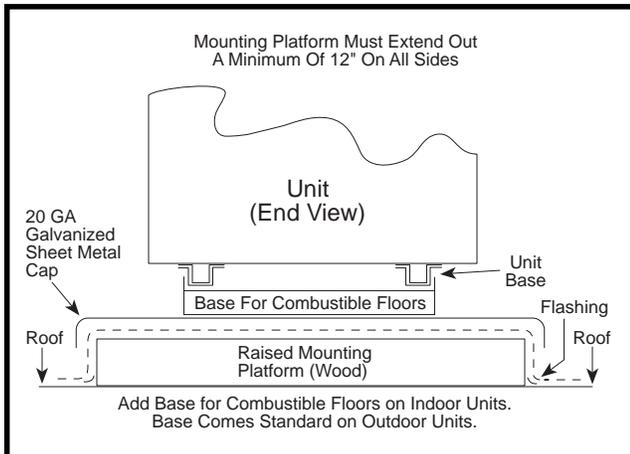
Typical Heater Installation with Base for Combustible Floors, Example B
